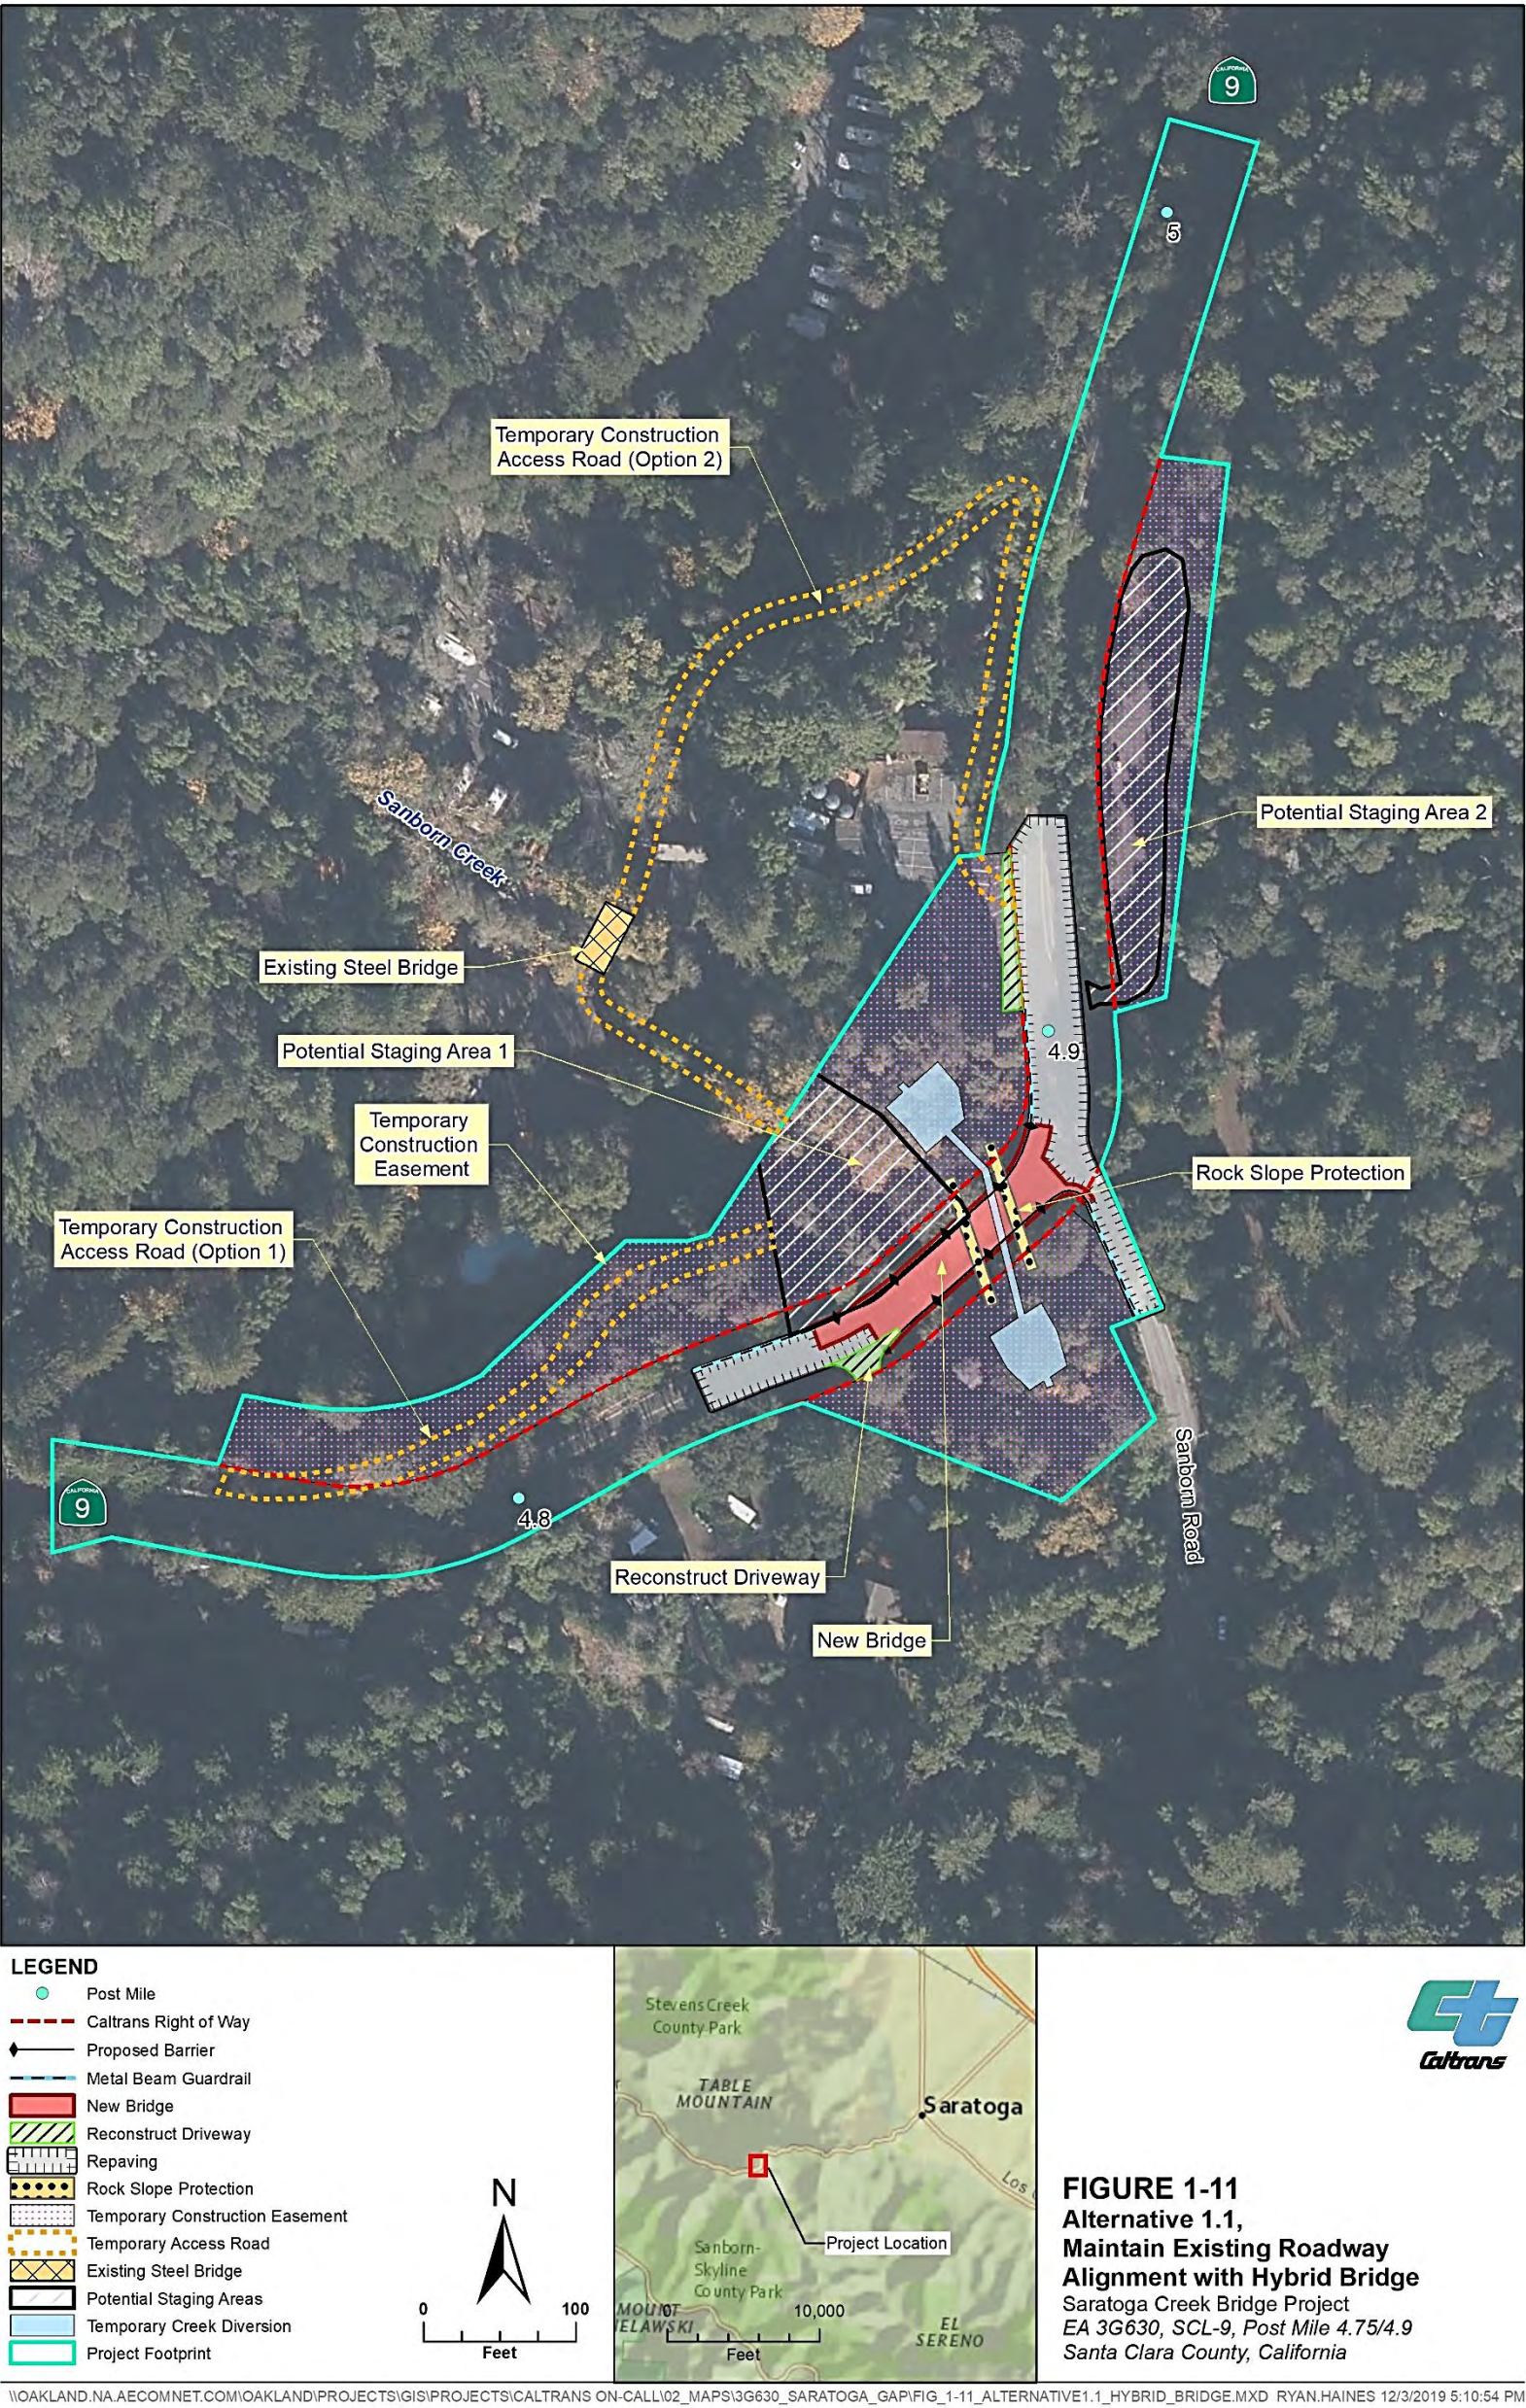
Alternative 1.1 Proposed Layout: Maintain Existing Roadway Alignment with “Hybrid” Bridge (“Hybrid” Alternative)
